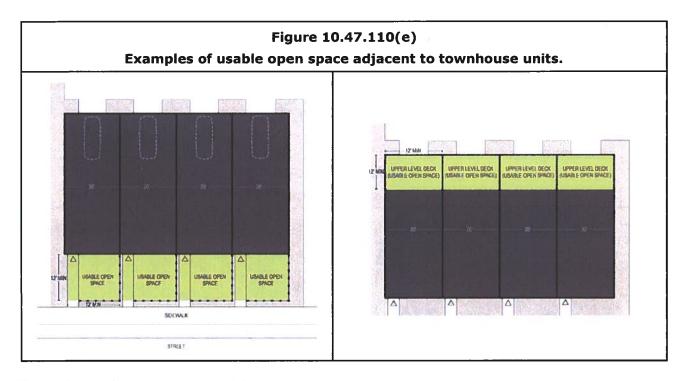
(e) Examples of usable open space adjacent to townhouse units.
